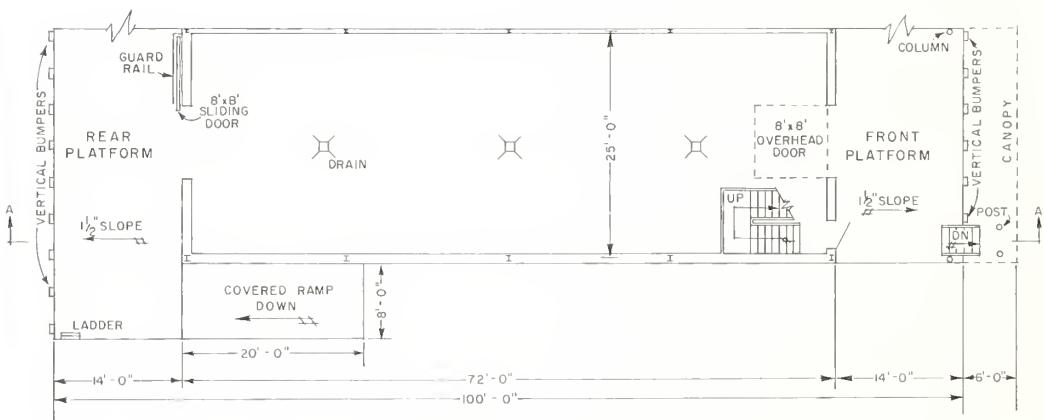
Layout of a fresh fruit and vegetable unit in a multiple-occupancy building. Notes: 1. The use of a utility tunnel is optional. Without the tunnel, refrigeration equipment could be located on the roof and utility lines along walls inside the building. 2. Buildings shown have support columns. Recent studies, completed during the writing of this report, indicate there would be little or no increase in cost to construct this building without support columns.
